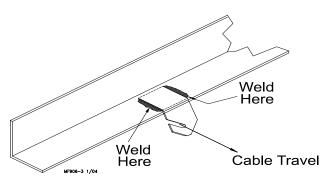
Welded Steel Truss Ceiling Bracket Installation
